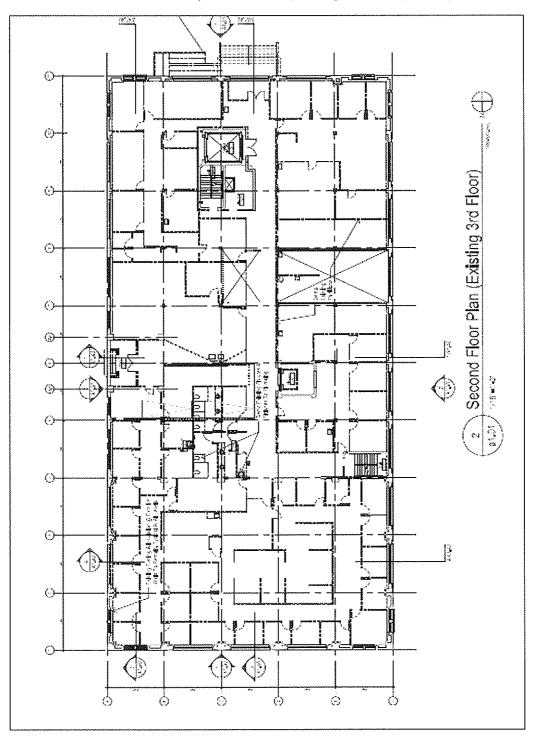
Floor Plans, As Built, Basement (1st Floor) through Floor 4 (5th Floor)
